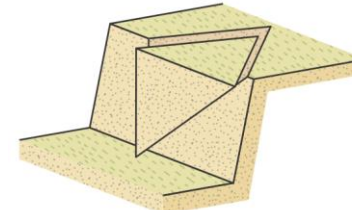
Plane failures along bedding planes on slope benches (slope height: 60 m).
